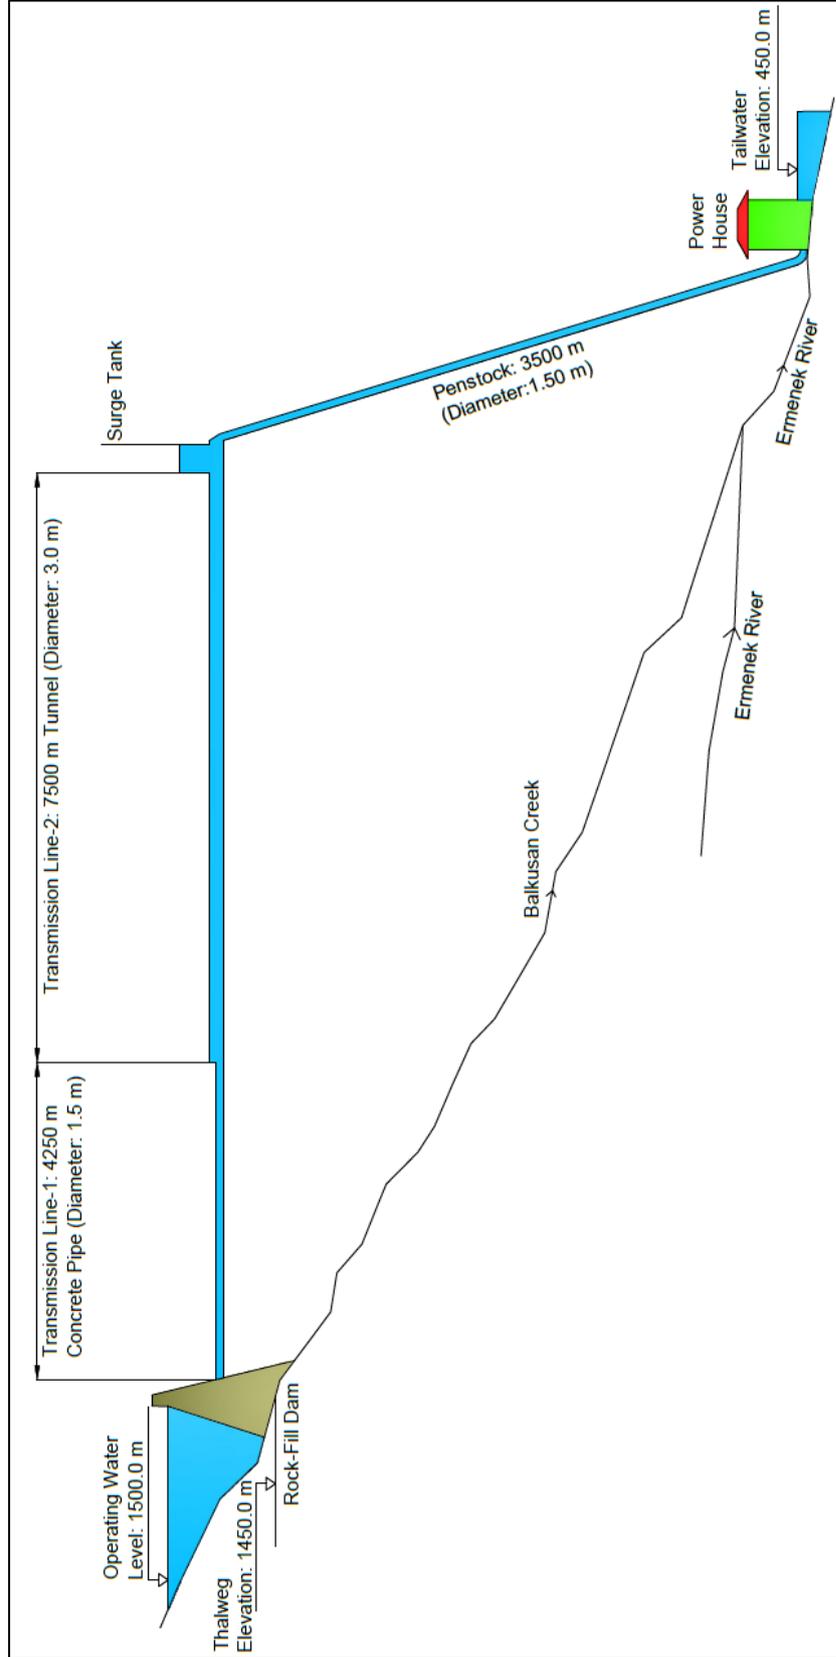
Plan of the EIEI-formulation (Not to Scale)
